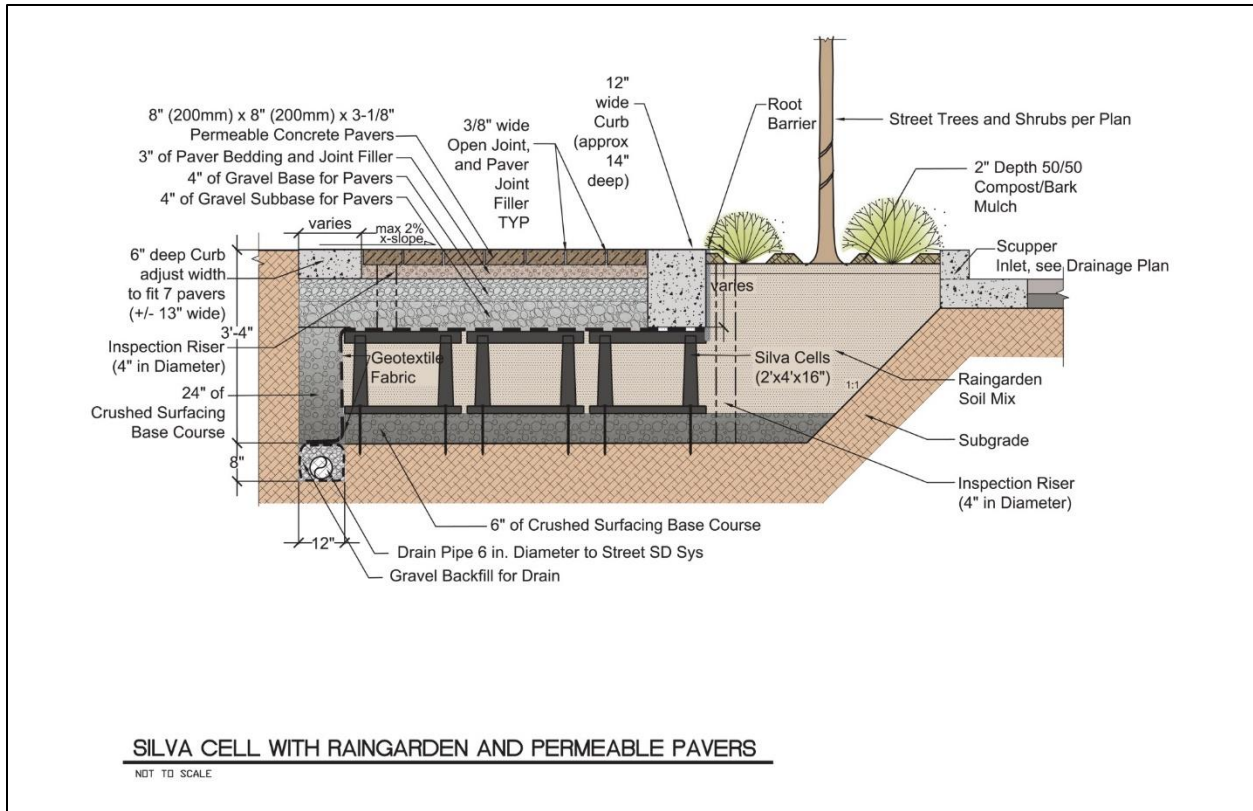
Cross Section detail of a tree well filter with Silva Cells under pervious pavement
